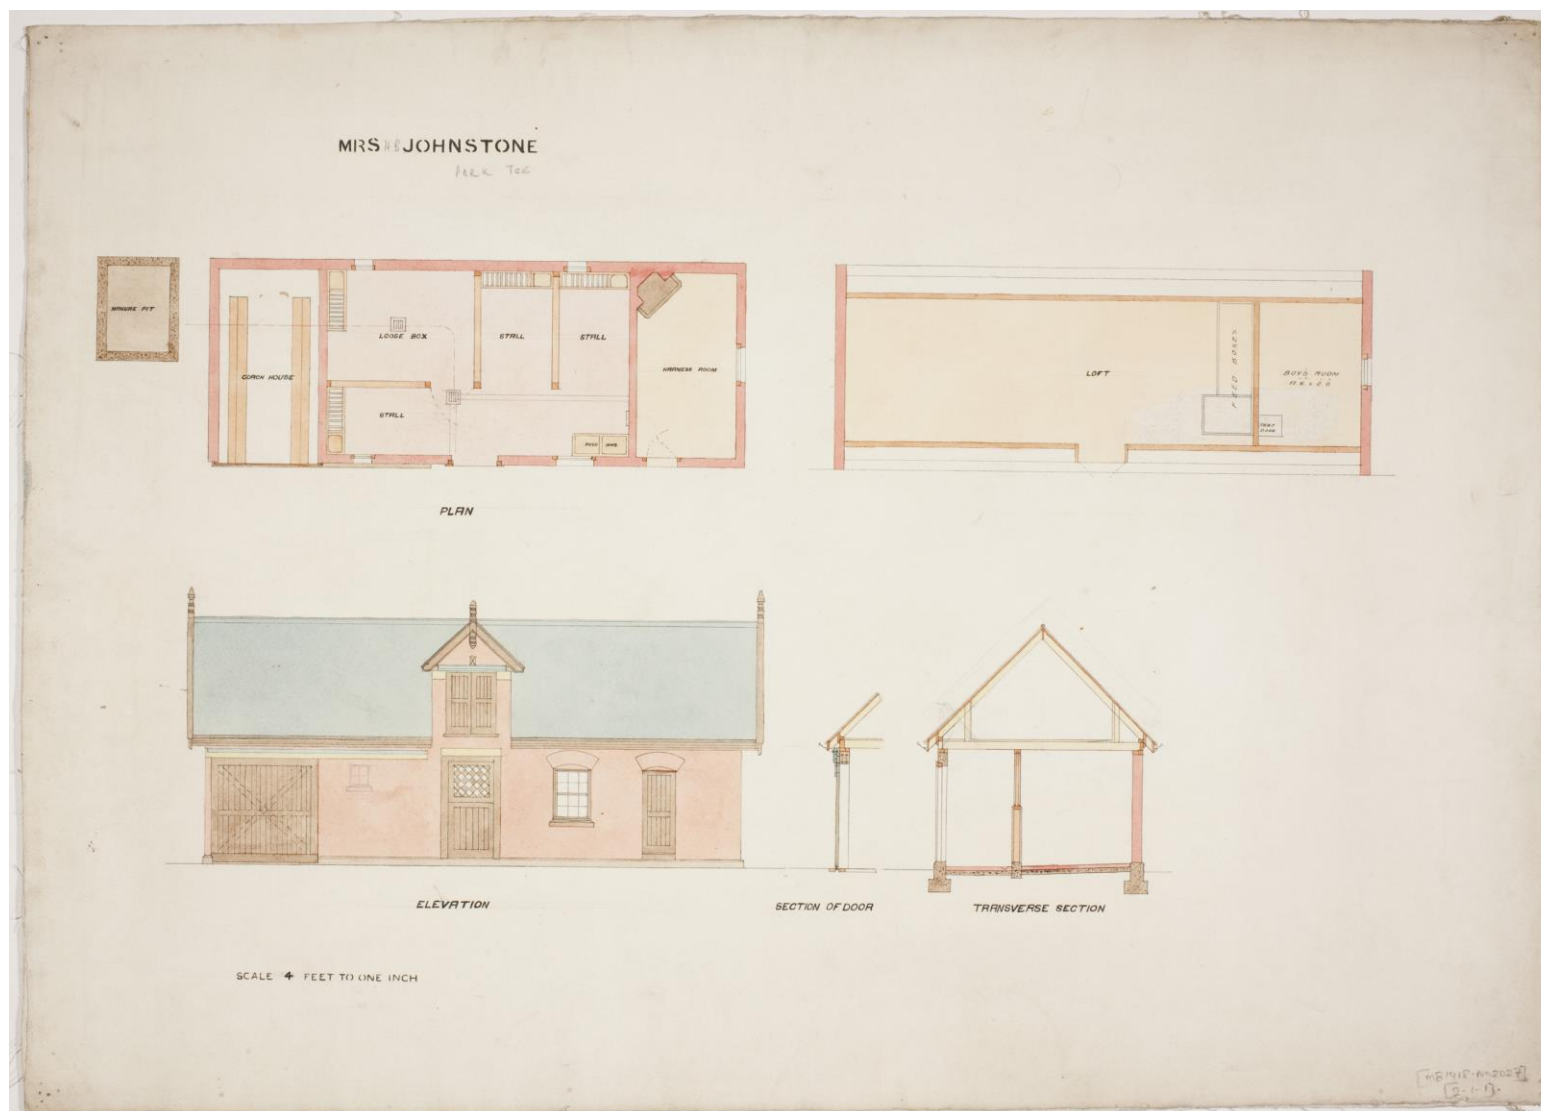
Collins and Harman, Mrs Johnstone, elevations, plans and section of stables (1902).
